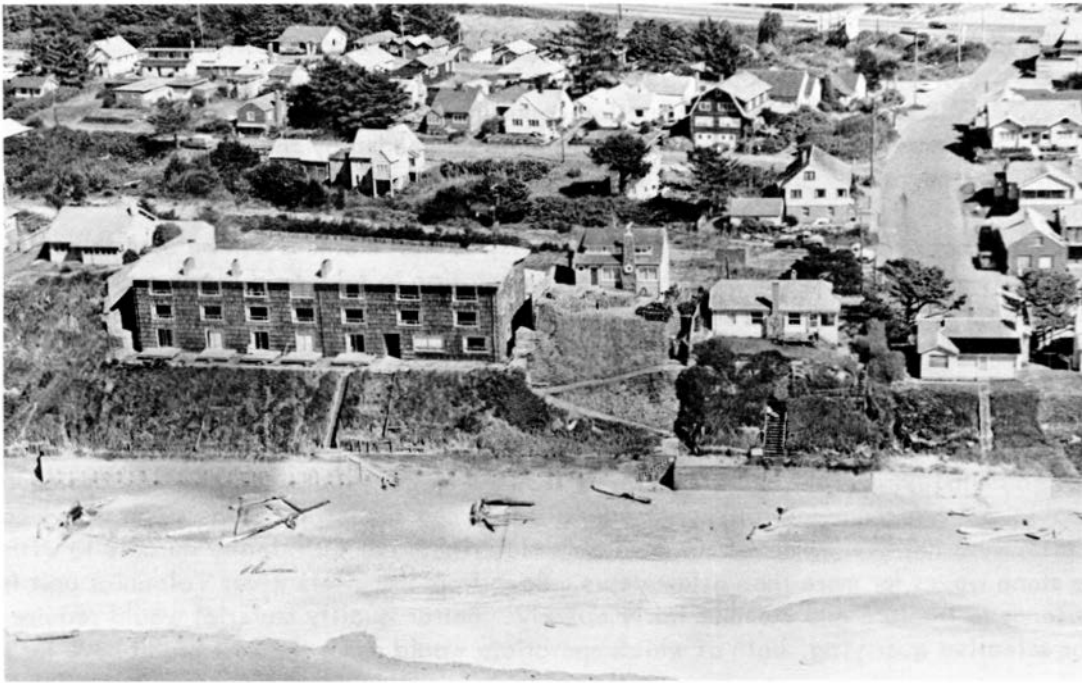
Concrete sea wall and sloped and planted terrace bluff provide excellent protection from storm-wave erosion for these buildings in Lincoln City.
